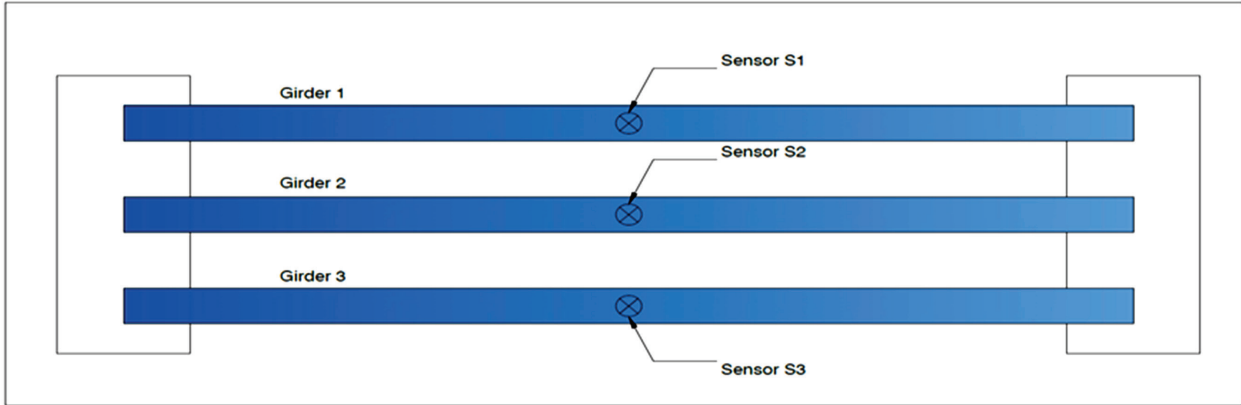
Arrangement of Sensors (LVDTs) at the center of each girder
